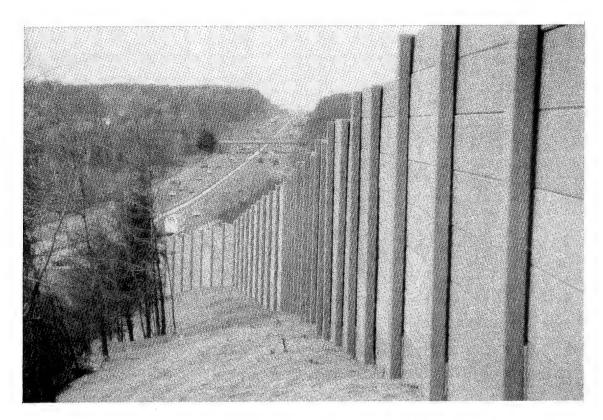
Section of precast concrete post and panel noise barrier wall installed along Interstate Route 80, New Jersey (from Guzaltan 1992)
